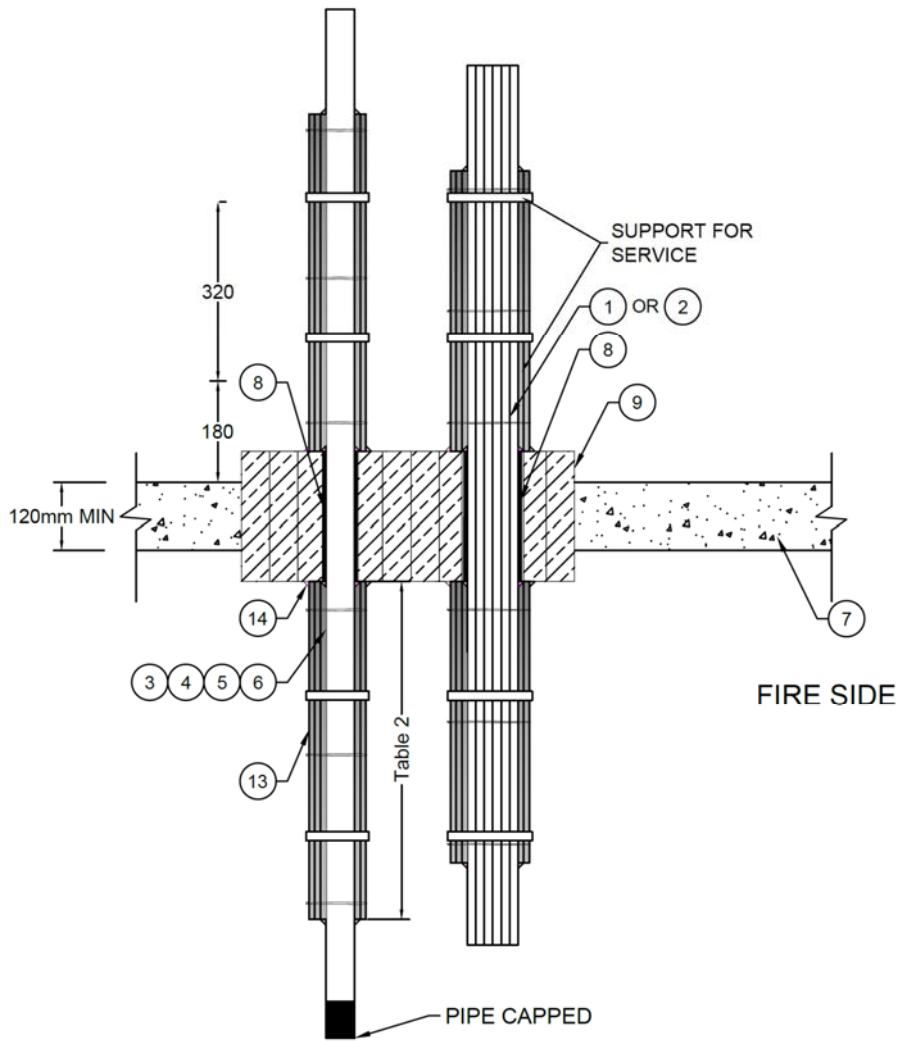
Typical details for cables and metal pipes penetrating 3M Fire Barrier Pillows in floors
